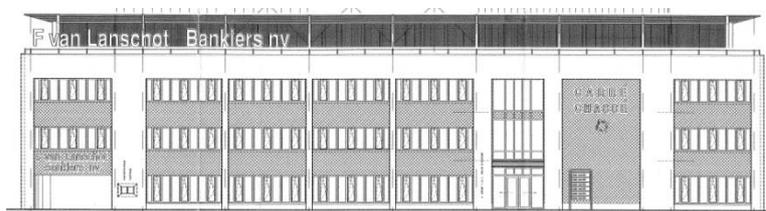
Architectural drawing of Merin Building (Heijmans Internal Document)
